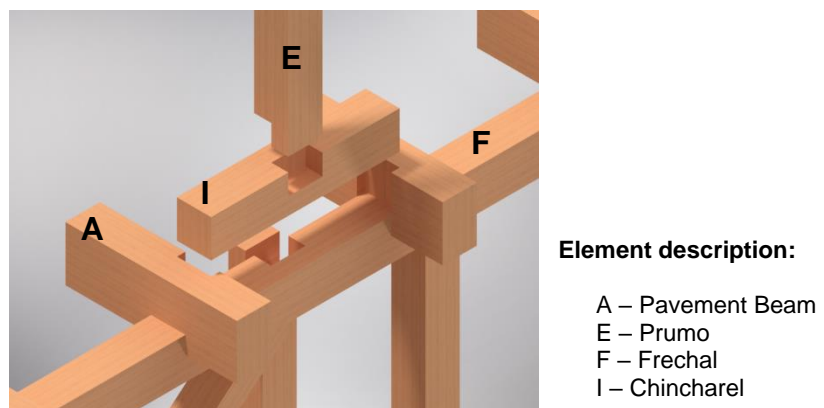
Example of connection made to continue the vertical elements throughout the building – Schematic representation. (Adapted from (Mascarenhas, 2004)).
